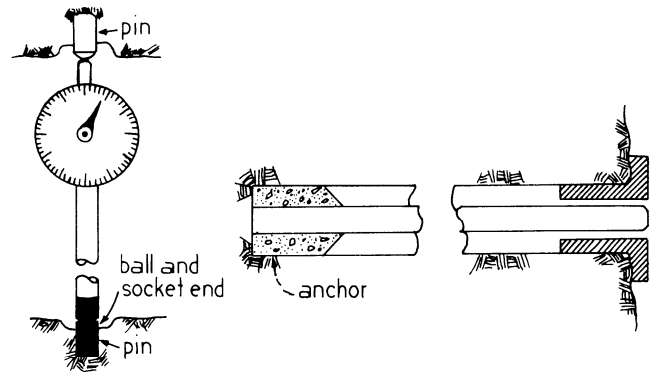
Tube extensometer setup (after Obert, 1973).
